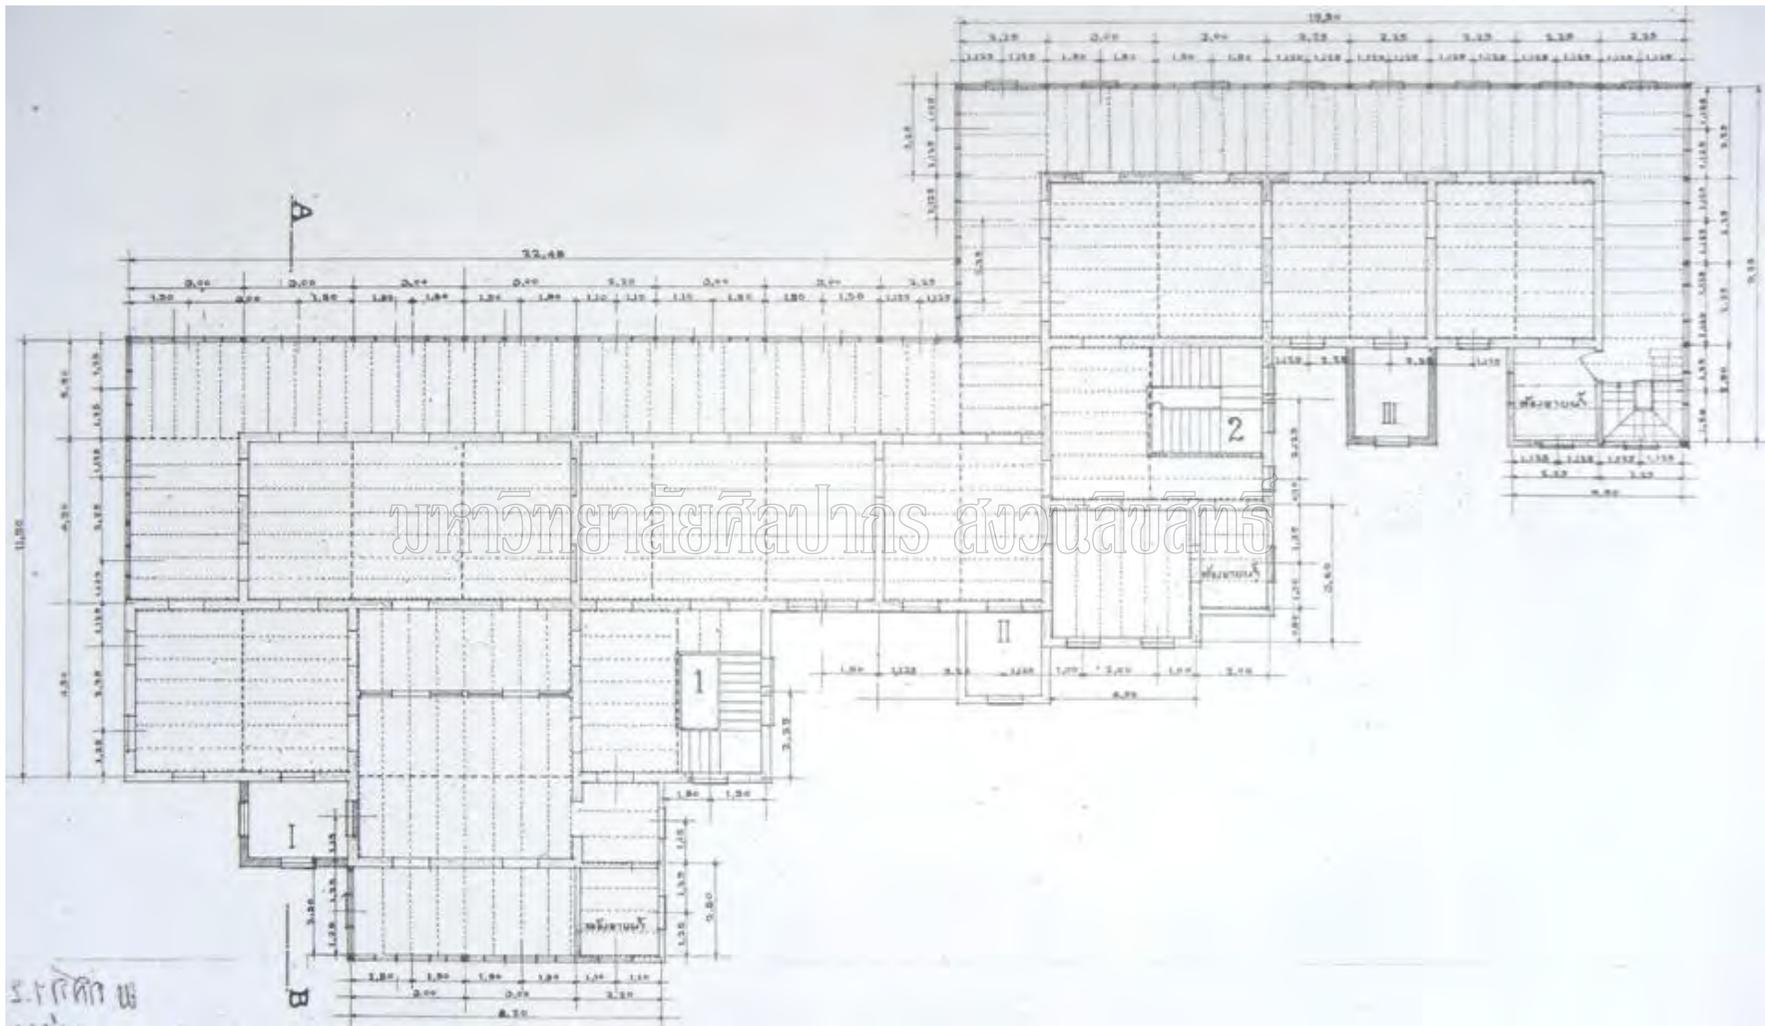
Upper Floor of Unnamed Plan by Fine Arts Department
